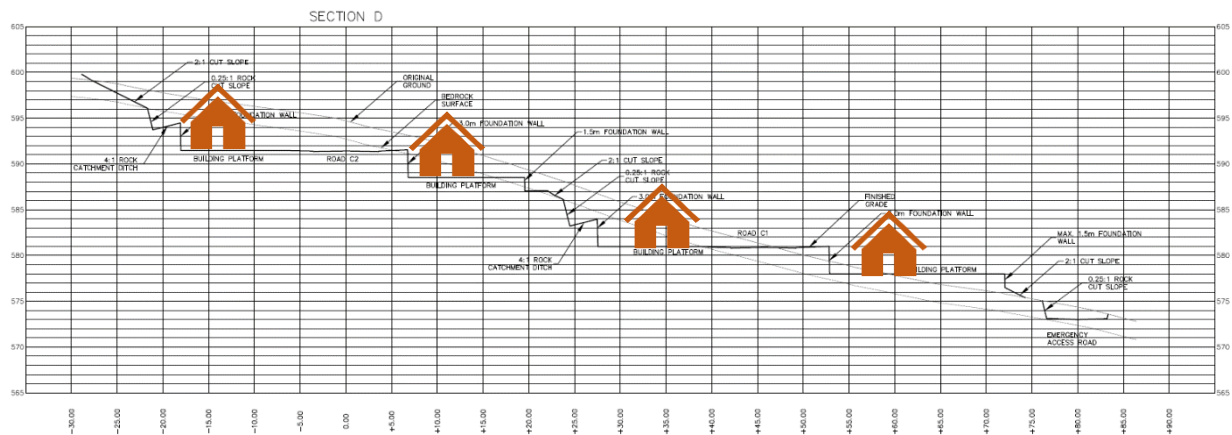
Site cross section looking north/south across the development. Note stepped hillside integration. Orange houses denote building platforms
